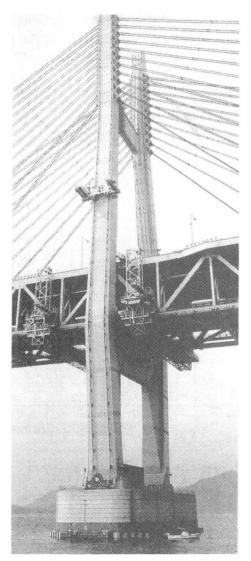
Work vehicle for inspecting girder and tower exteriors
